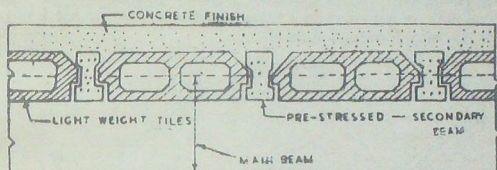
Prestressed beams with a hollow clay tile floor have a sort of slope given to their top so that they have more depth at the centre of their span. I-beams are economical but for greater
